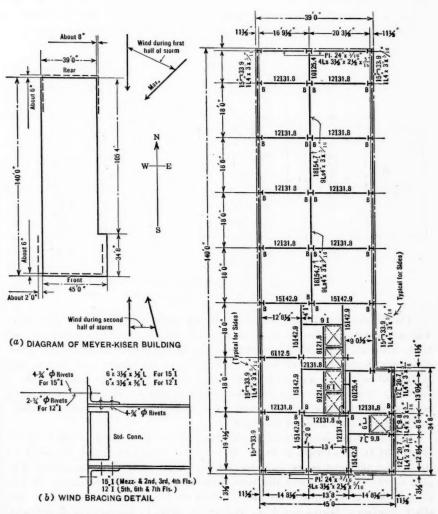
Plan and Details, Meyer-Kiser Building.
